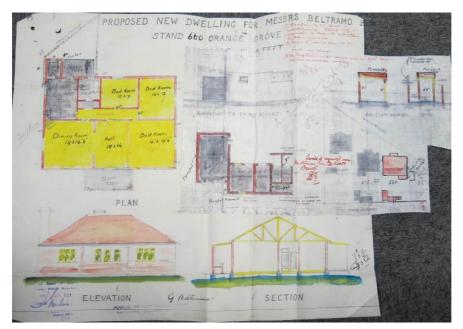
Plan for proposed new houses on Stand 660, Orange Grove from 1926 Good example of three bedroomed single storey residence with corrugated iron roofing and centrally located from stoep
